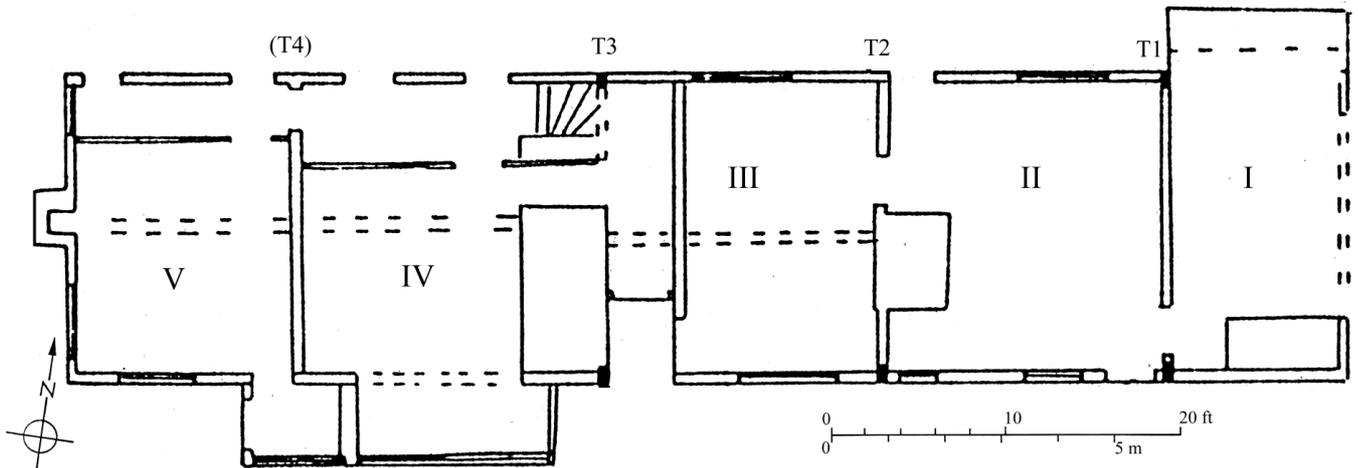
Plan, showing truss and bay numbering (after Currie (1976)).
